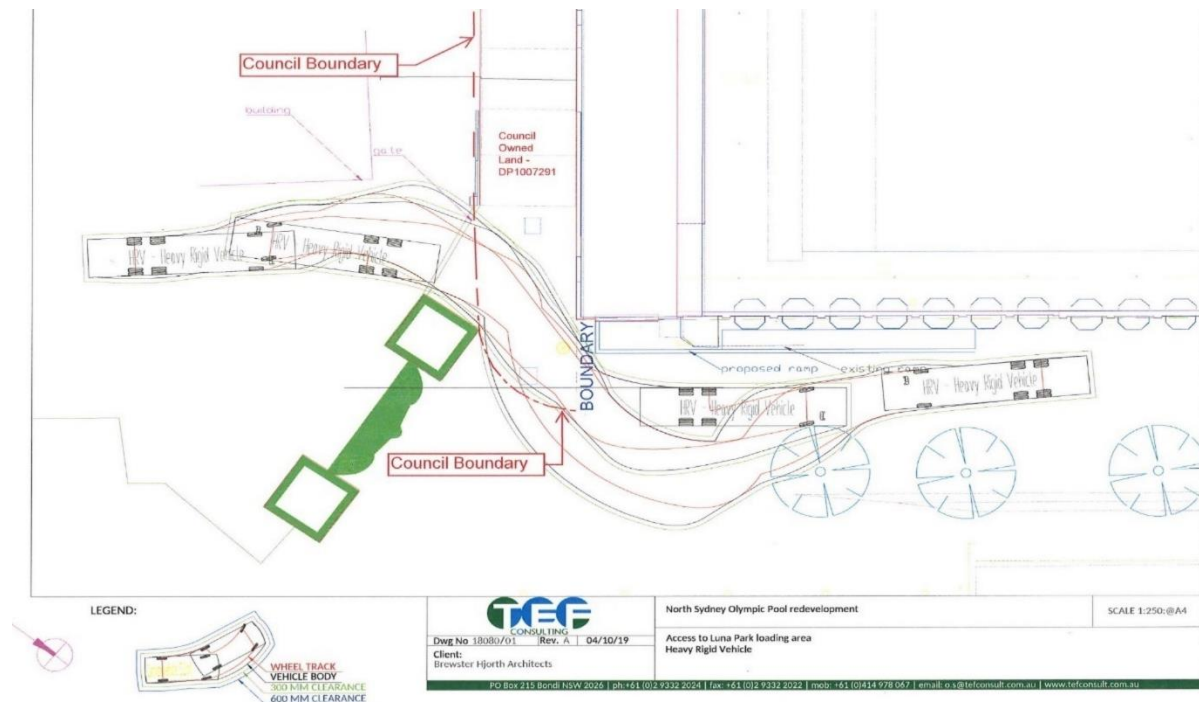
Current Truck turning plan Heavy Rigid Vehicle – HRV – access to Luna Park Loading Area – over Council land.
